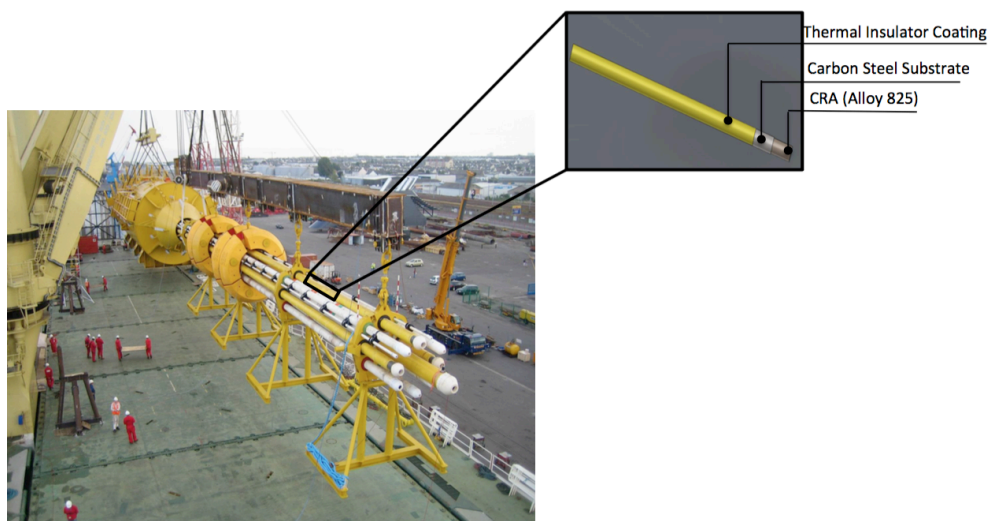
Upper section of the riser where pitting corrosion was observed and layout of the steel clad pipe
